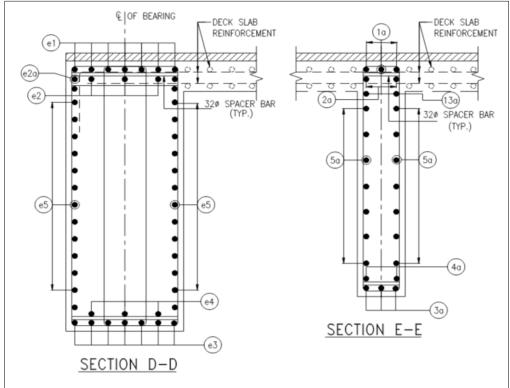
Diaphragm Reinforcement Sections; End (L), Intermediate (R)
